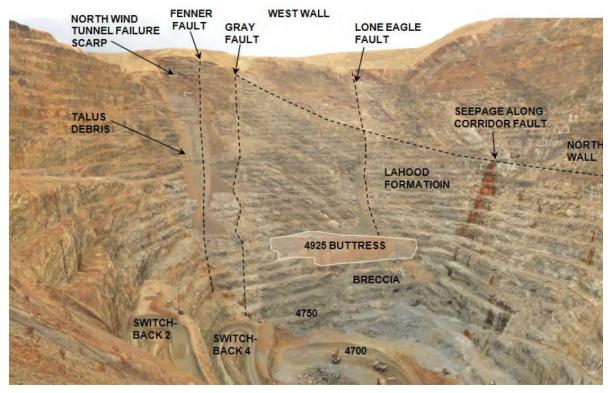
Annotated Photograph of the West Highwall of the Mineral Hill Pit (From Subterra LLC [2020b])
